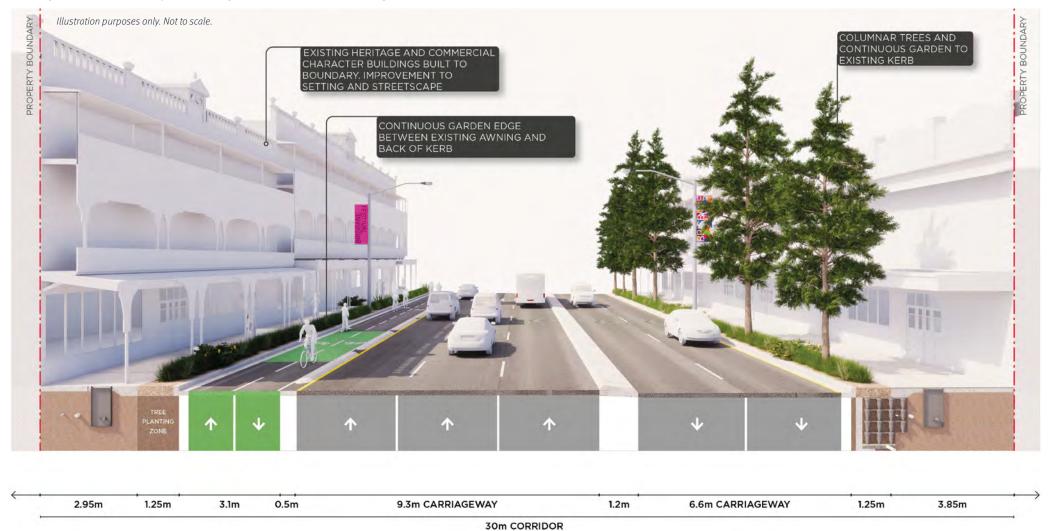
Cross section - Stanley Street - Precinct 5 - subtropical boulevard (major)
